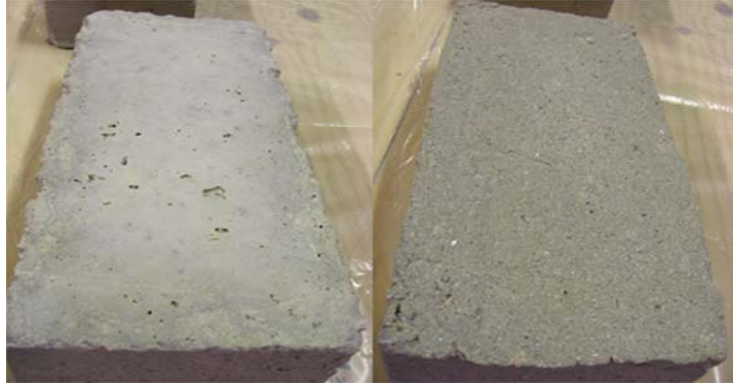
Concrete surface before (left) and after (right) sandblasting
